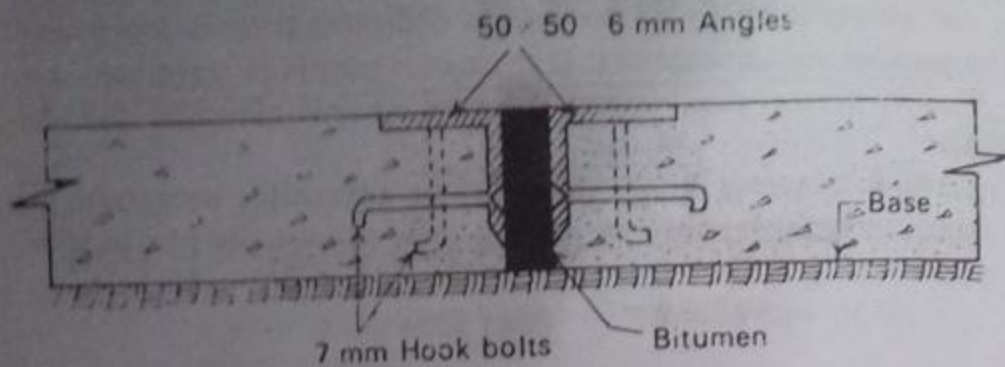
Joint in Road Slab carrying heavy traffic.
